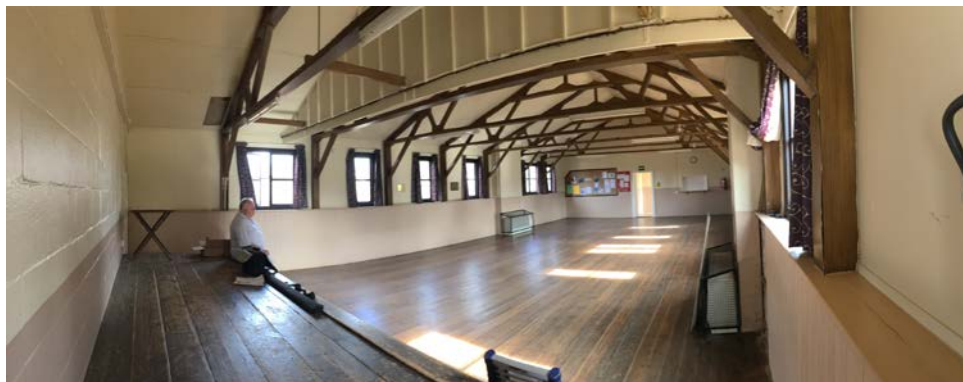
Internal view of the hall from the southern corner adjacent the stage
